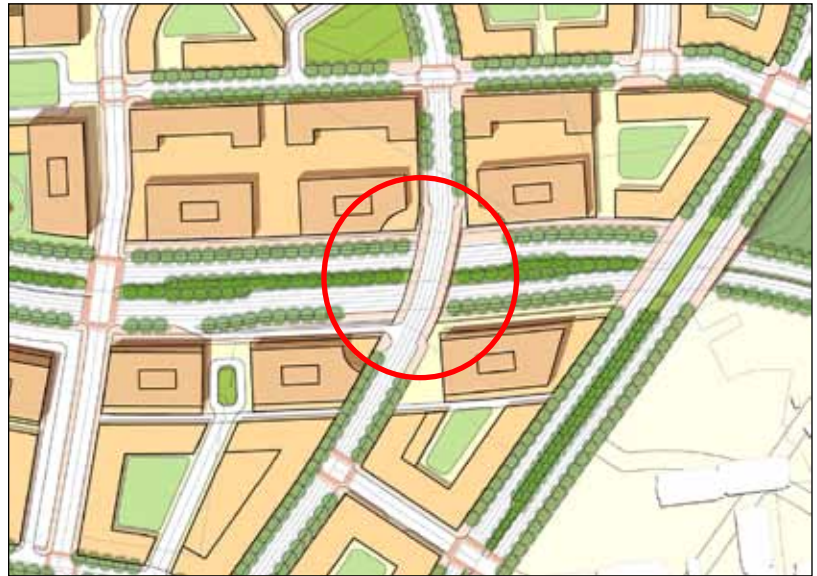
Option 1. A new signature bridge over Duke Street with access ramp from eastbound Duke Street to New High Street.
